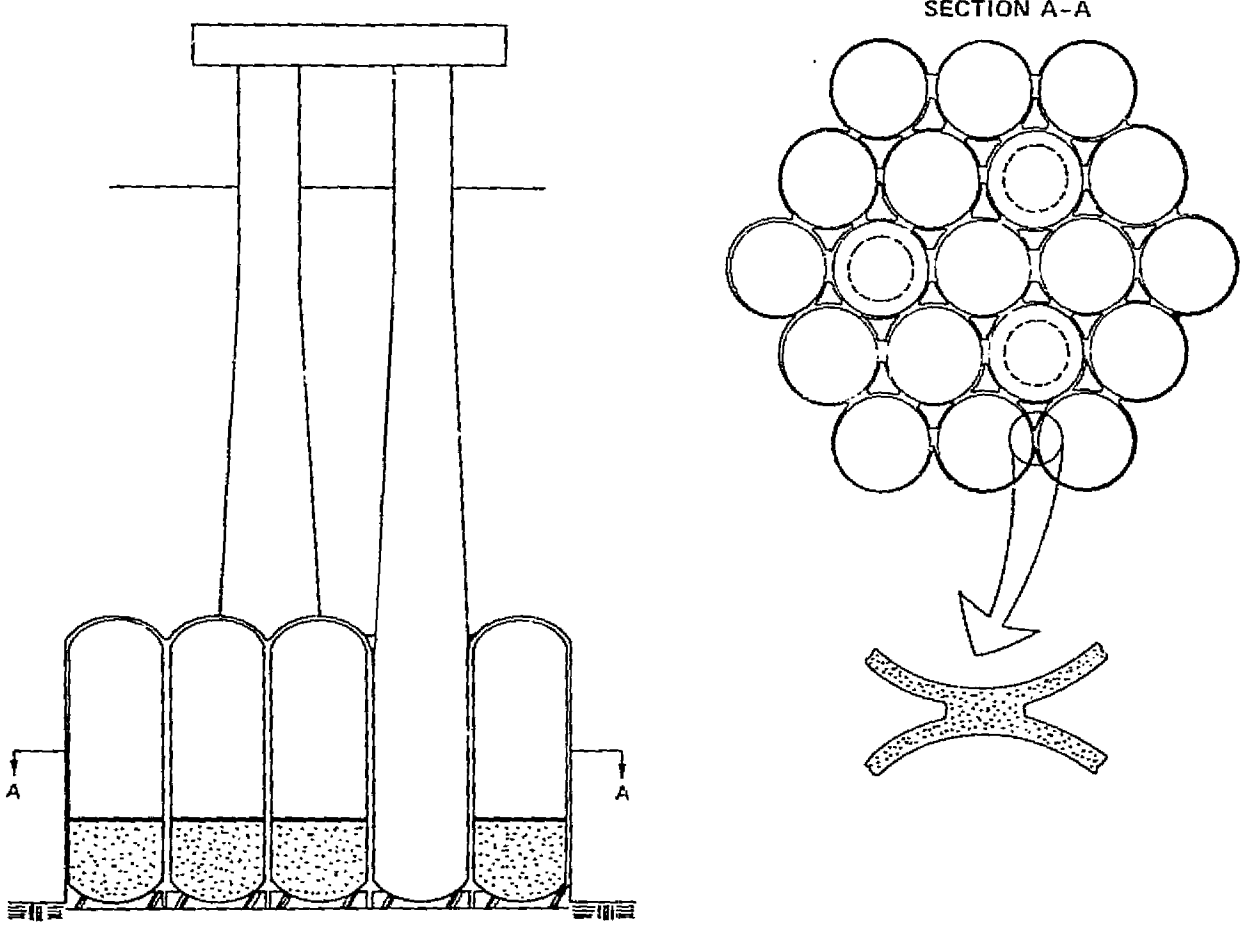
TYPICAL CONCRETE GRAVITY STRUCTURE
